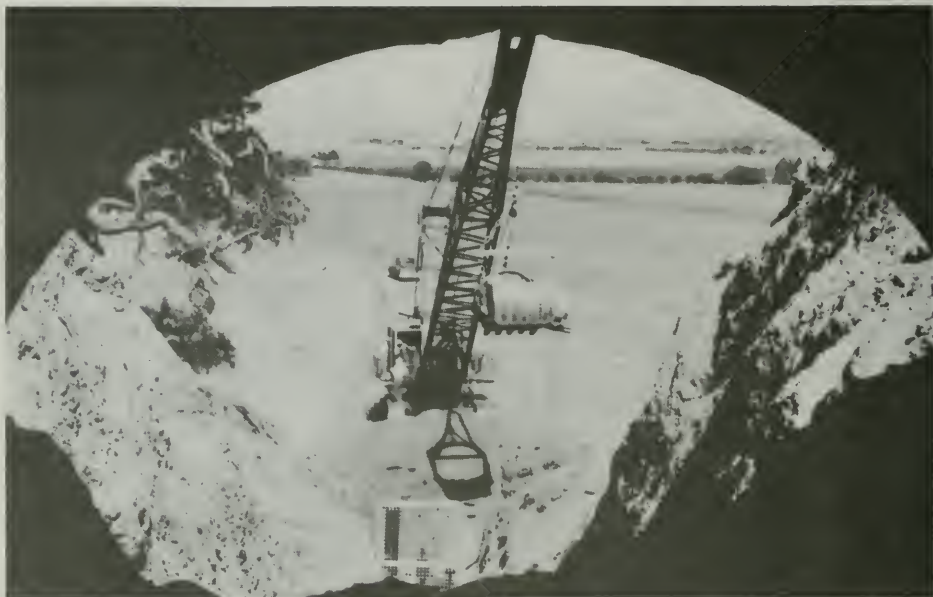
Pipe Trench Excavation—Del Valle Pipeline
